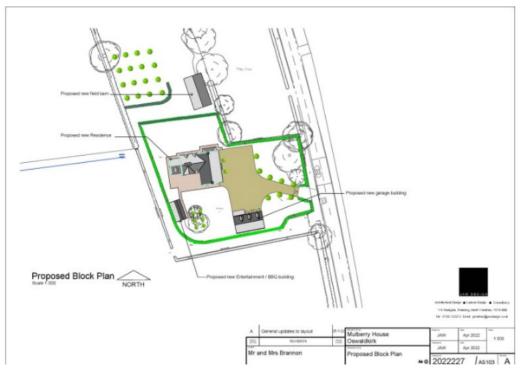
Planning Application Ref 22/01354/FUL: Approved Block Plan
